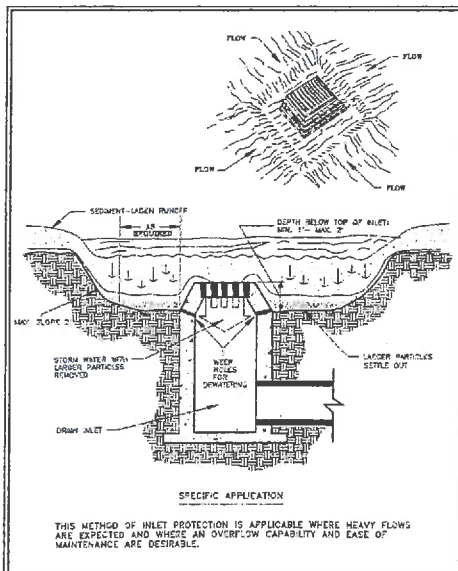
Excavated Drop Inlet Sediment Trap
